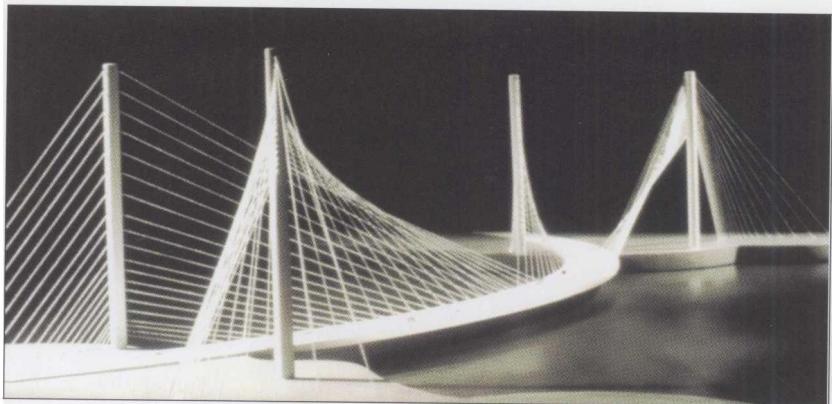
Arc Bridge to span 400 m on a plane, supported by 4 columns, conceived 1985
